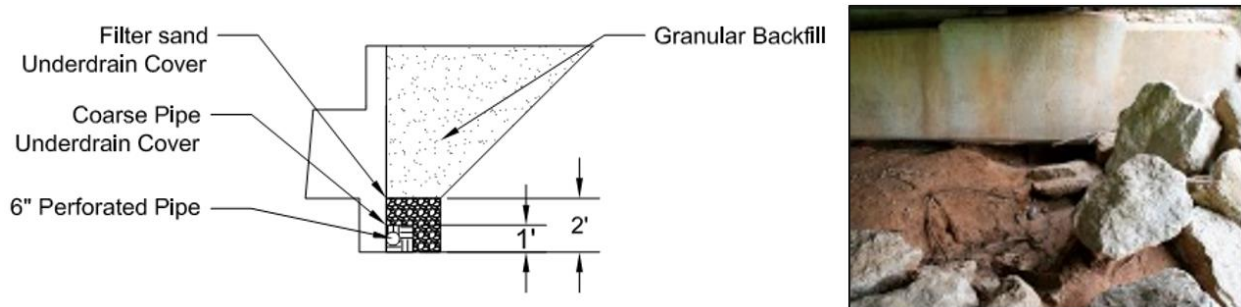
Underdrain Design, after ODOT Proposed Plan US 177 over Salt Fork, Bridge A
